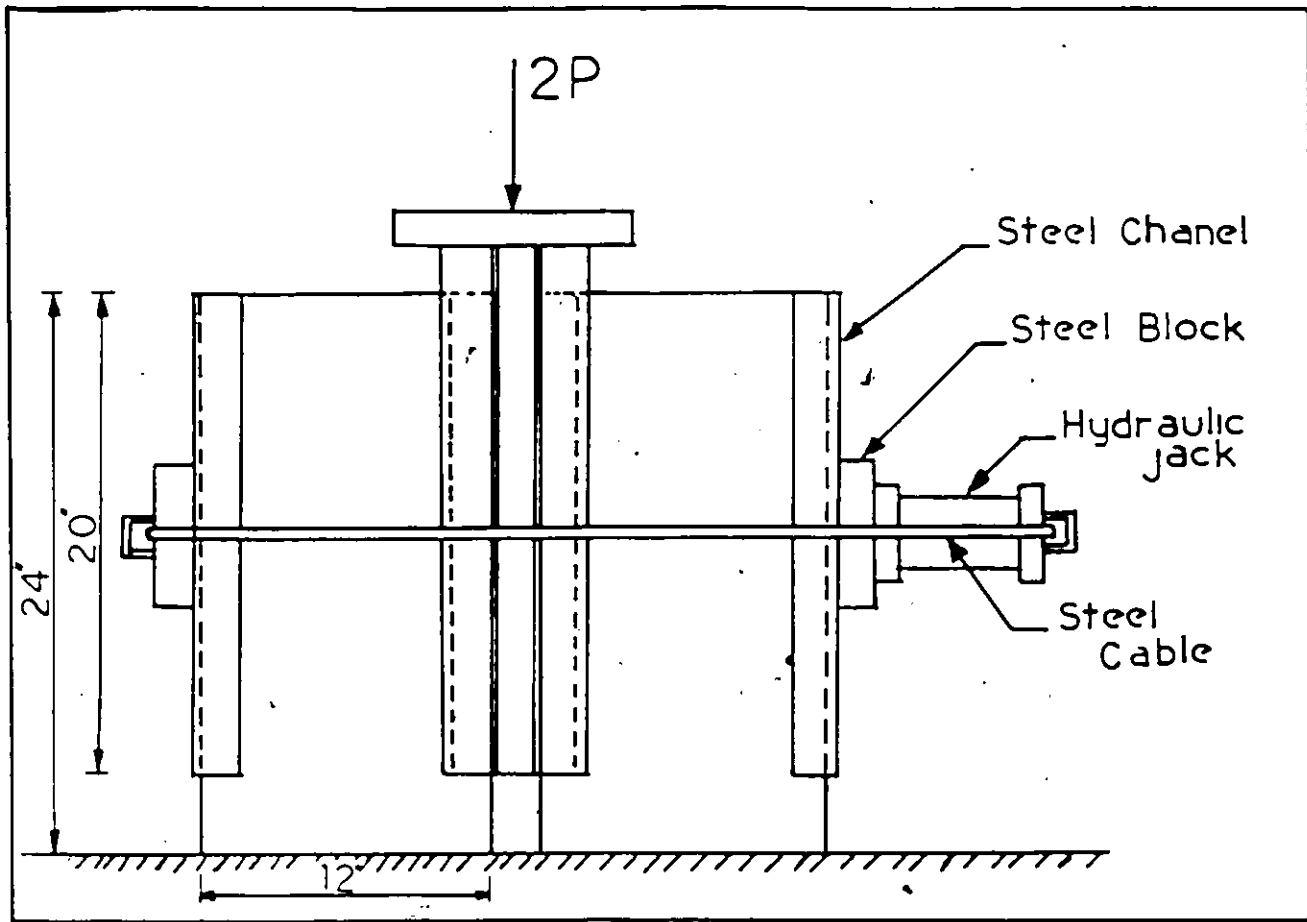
TESTING ARRANGEMENT FOR COMBINED
